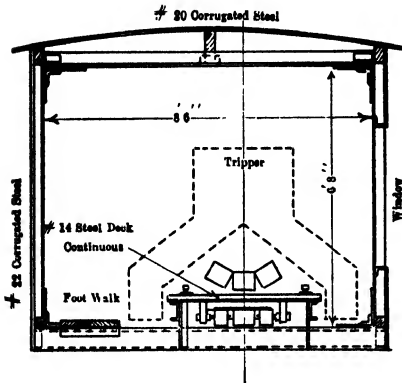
Defective Design of Steel Bridge and Belt Supports.
